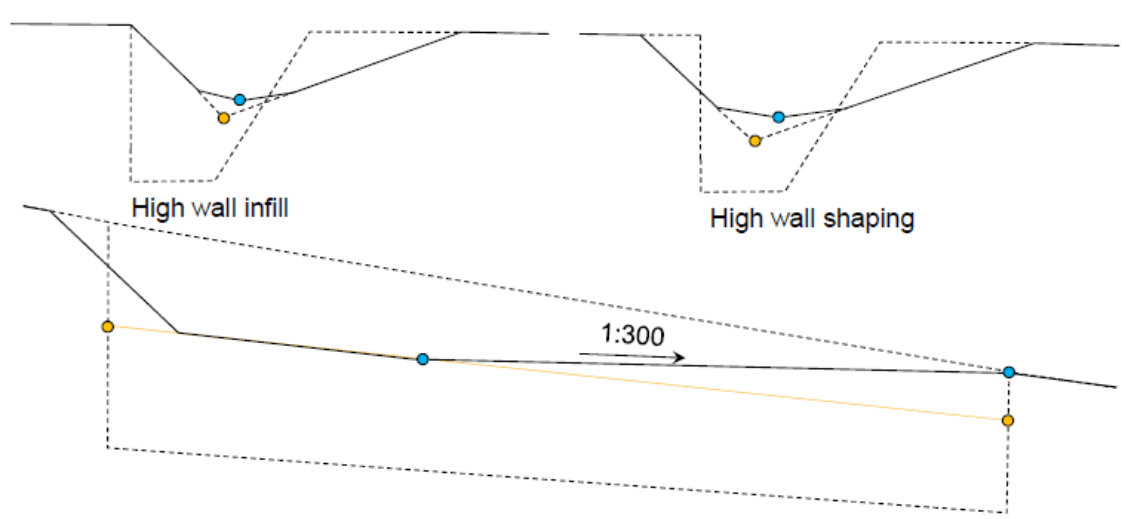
Typical fill to free-drain sections (A-A and B-B)
